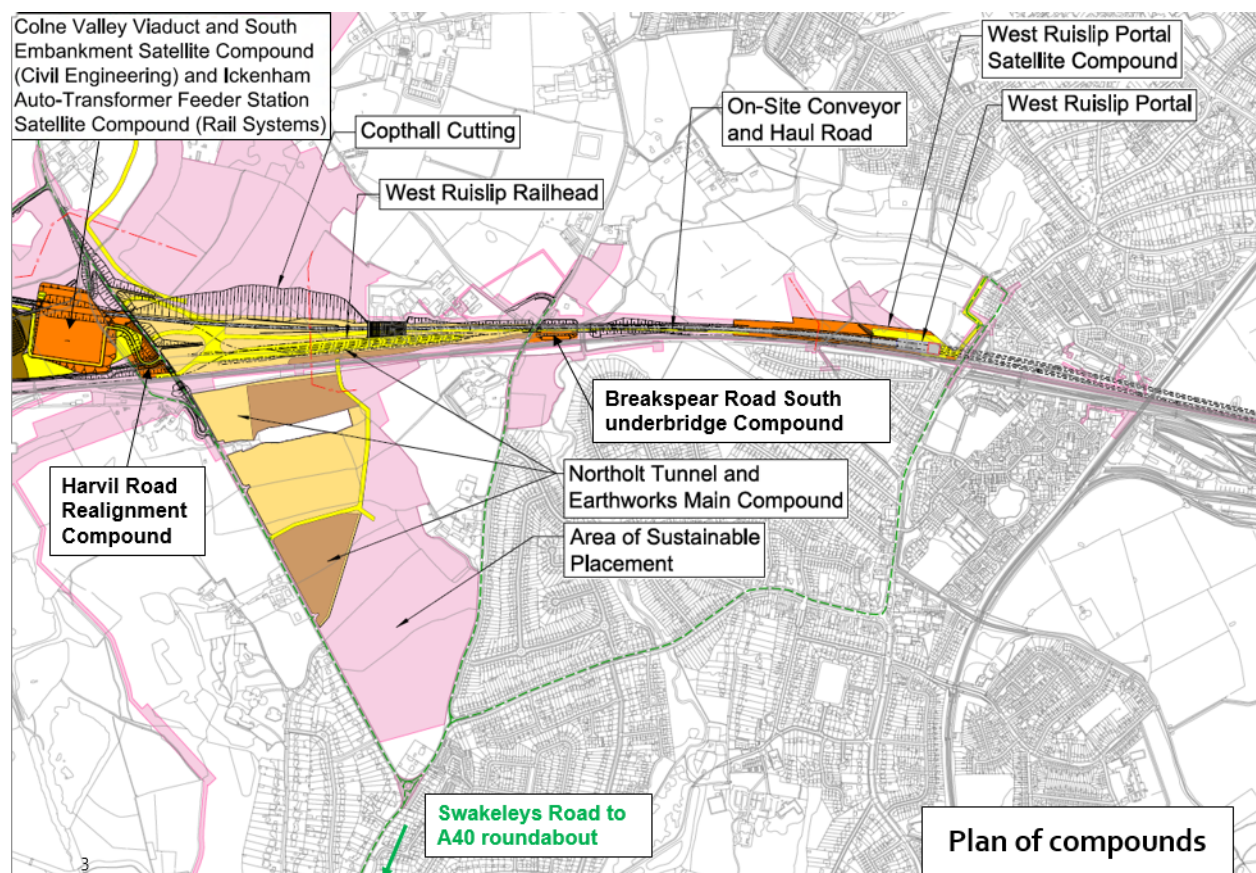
Plan of construction compounds showing traffic routes to the A40
